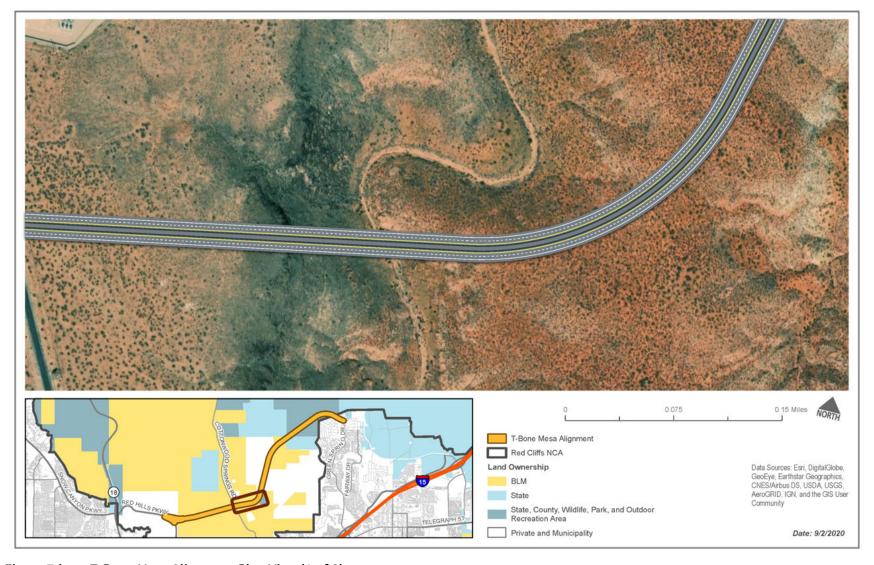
T-Bone Mesa Alignment Plan View (4 of 8)
